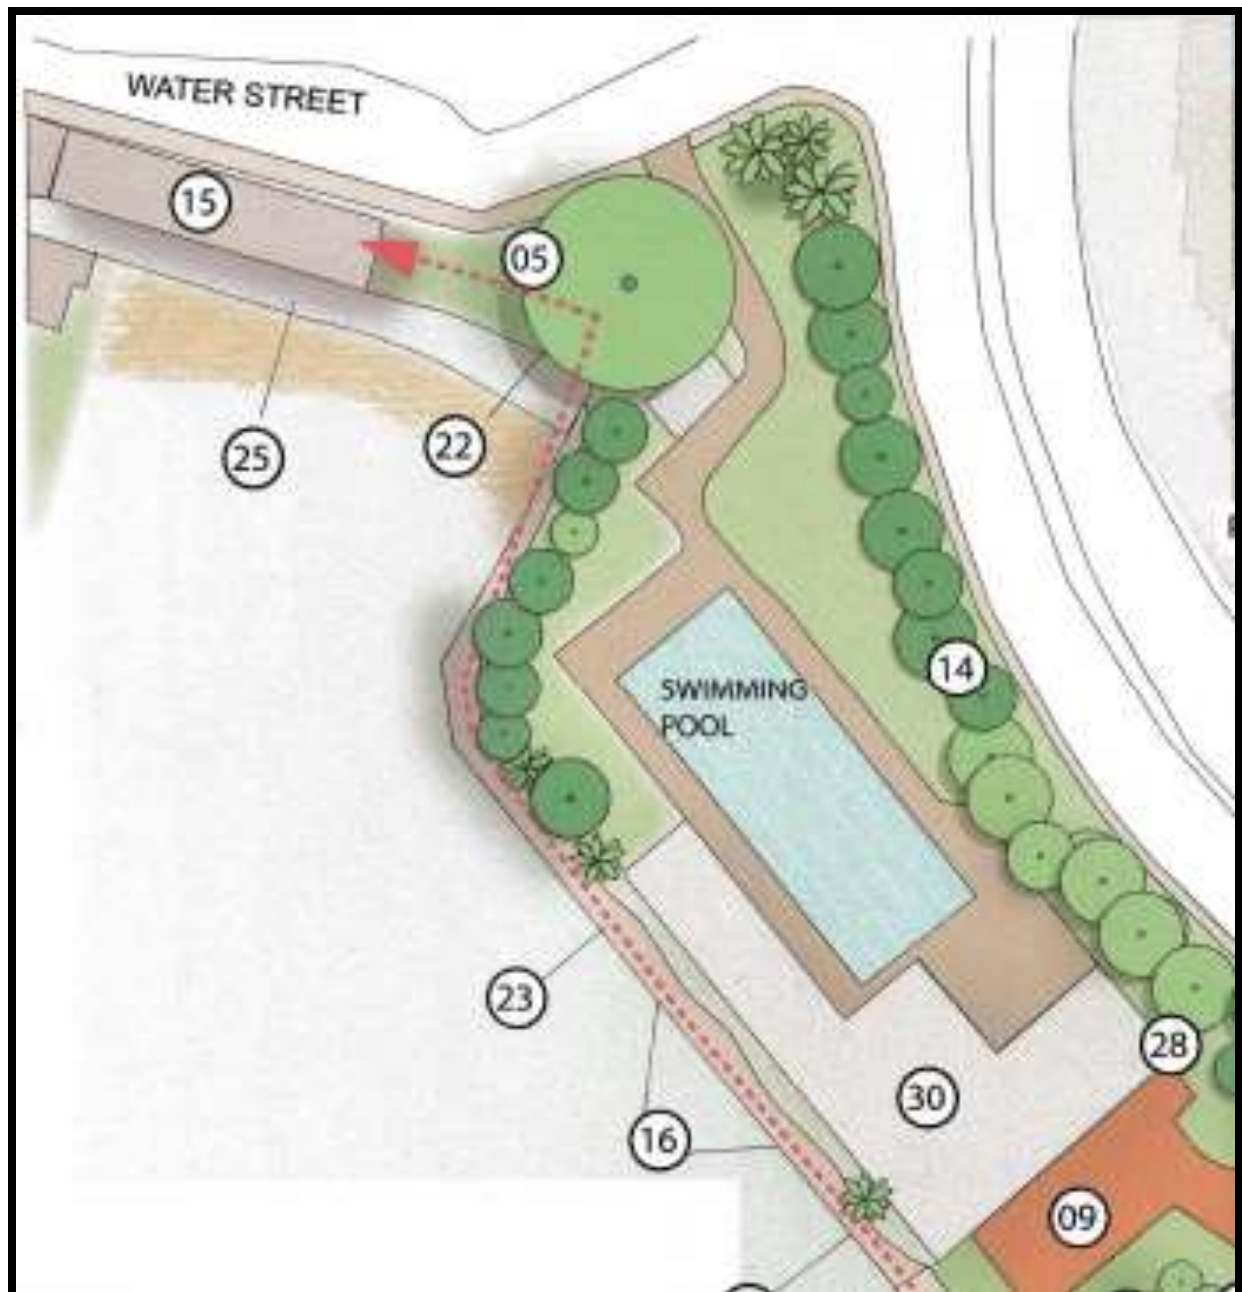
An extract from the Landscape Masterplan design showing the Bathers Pavilion (No.15)
